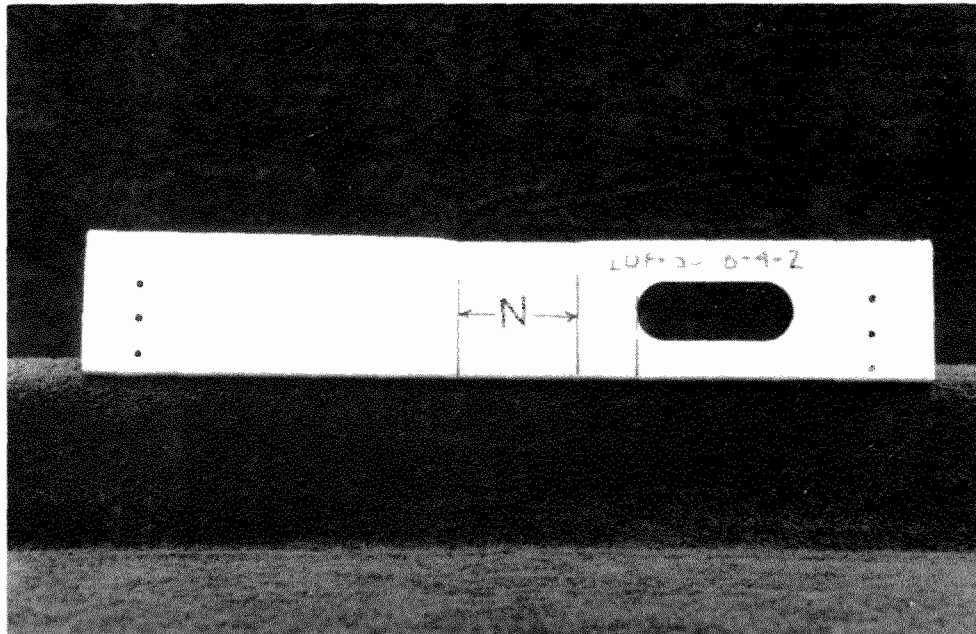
Typical Unreinforced Web Crippling Failure, IOF-SU-8-4-2
